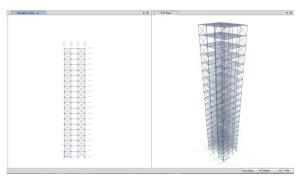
Elevation and 3D view of the building with X bracings at outer bays
